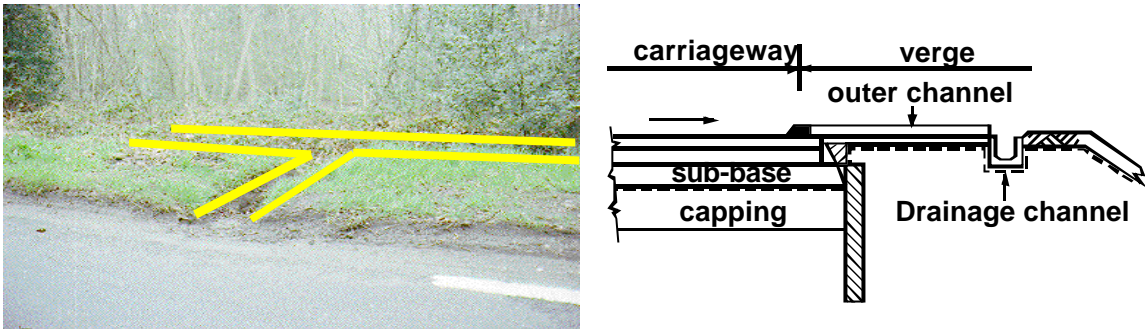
A typical scene of drainage channel blocks and a layout of its construction.
